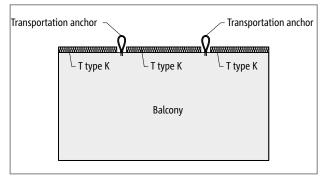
Schöck Isokorb® T type K: Precast balcony with transporter anchor; insulation spacer T type Z can be inserted on-site
